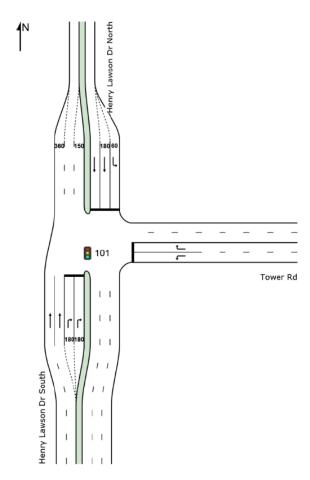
Henry Lawson Drive and Tower Road intersection Option 2
